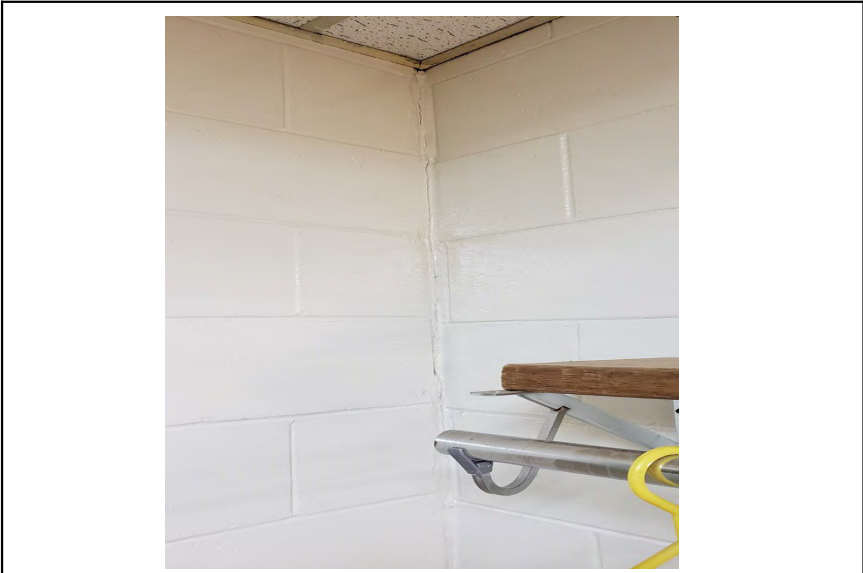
South-Side Stairwell Mortar Joint Cracking
